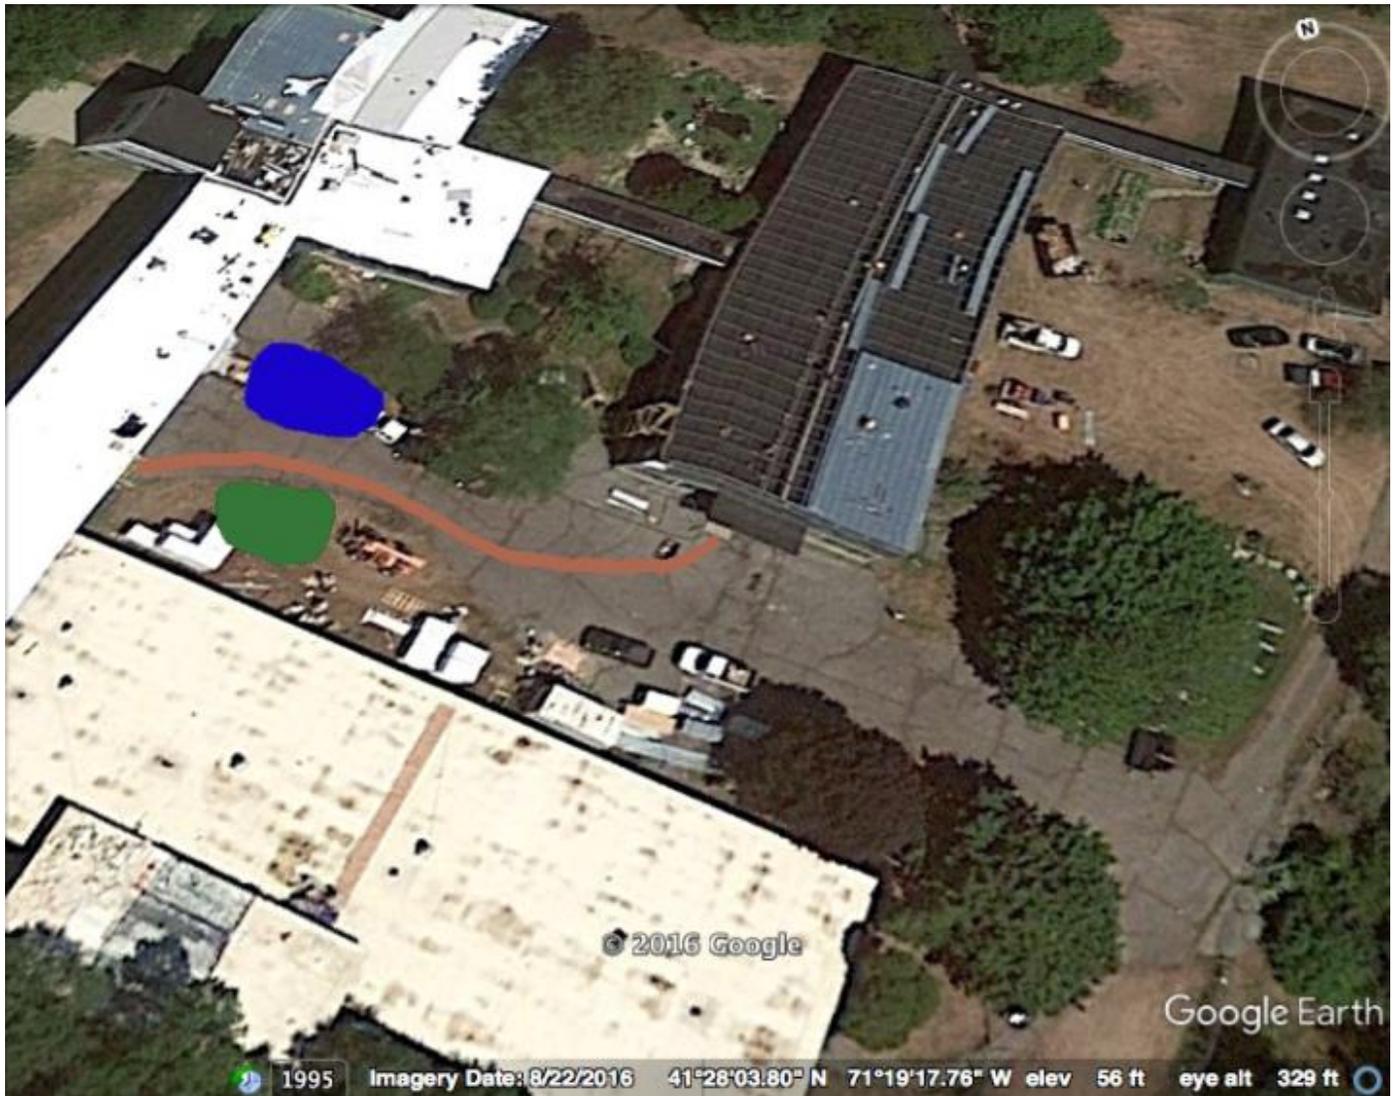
Proposed Area of Pavement Removal and Garden and Walkway Construction
